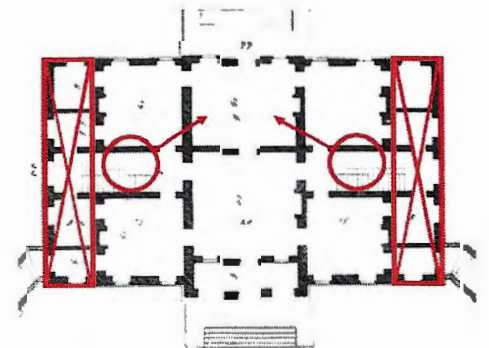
With two adjustments, Plate 58 of James Gibbs' *A Book of Architecture* (1728) bears a marked resemblance to the Drayton Hall floor plan.
